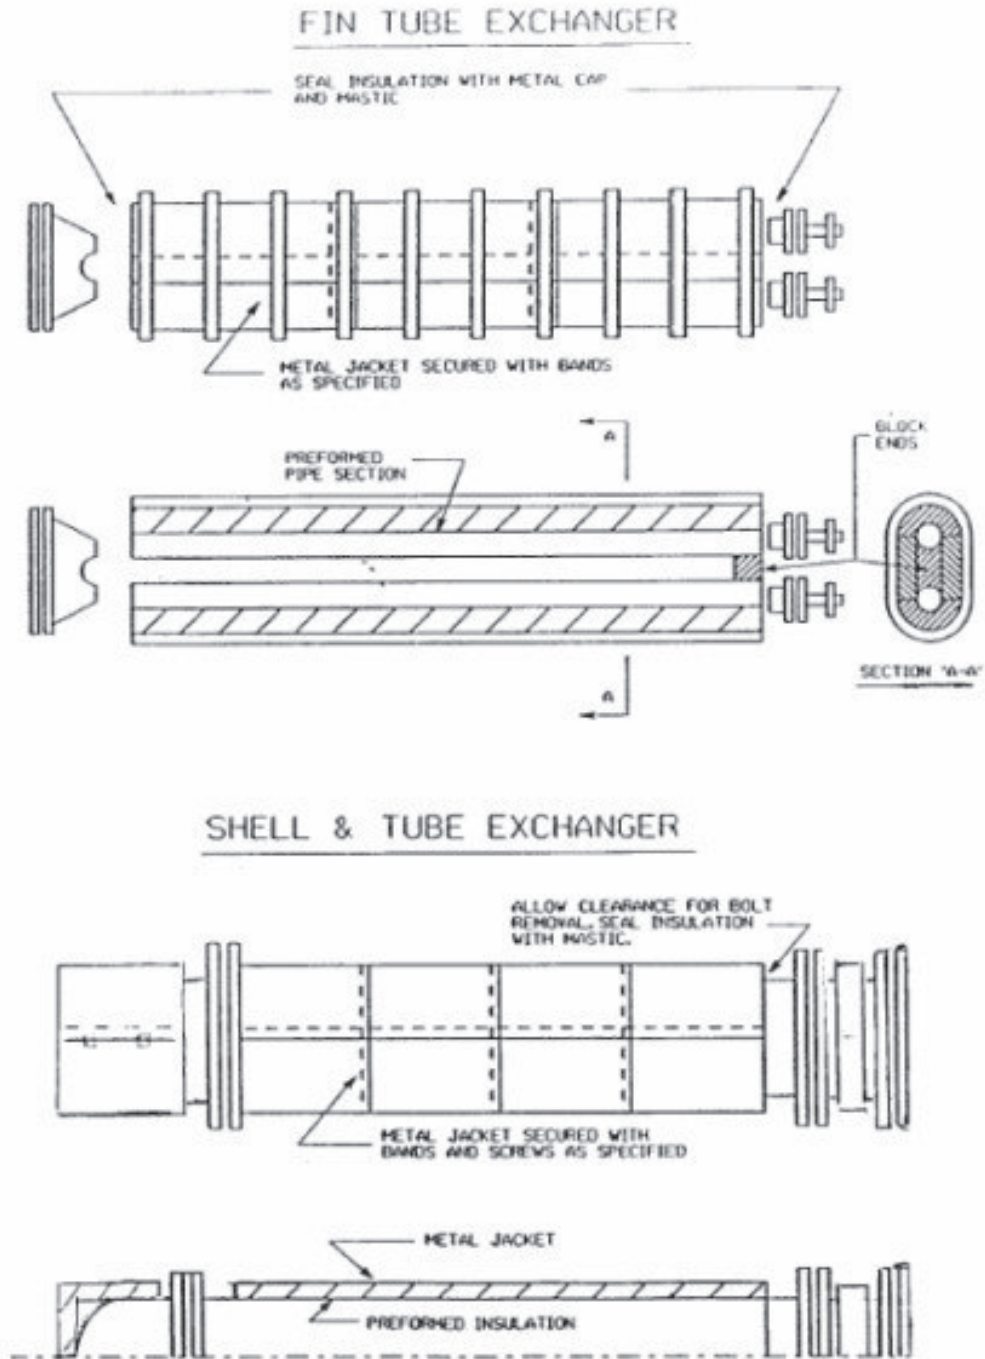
HORIZONTAL EQUIPMENT (3 OF 3)
